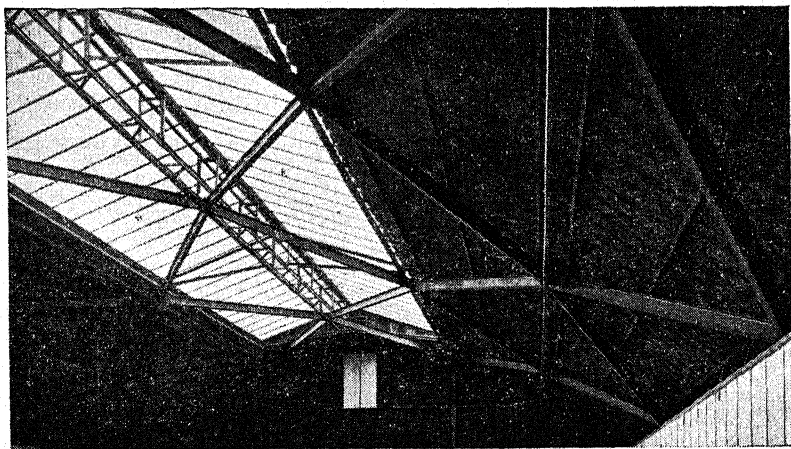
Parabolic arched grid roof of Badminton Hall, Epsom, England.
